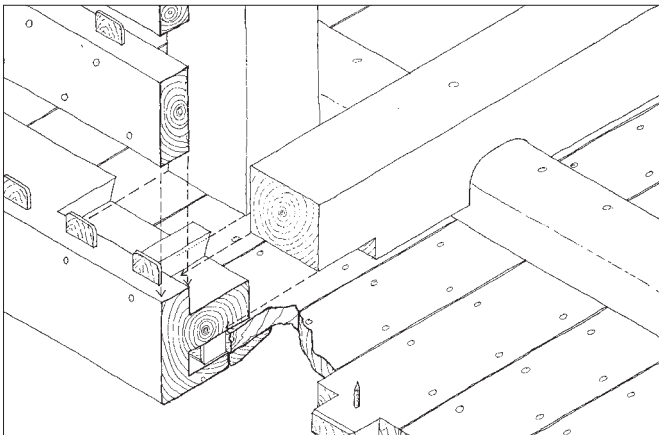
Detail of Area K caisson, junction of chine with end wall and floor planking, caisson K-2, Caesarea (C. J. Brandon).
